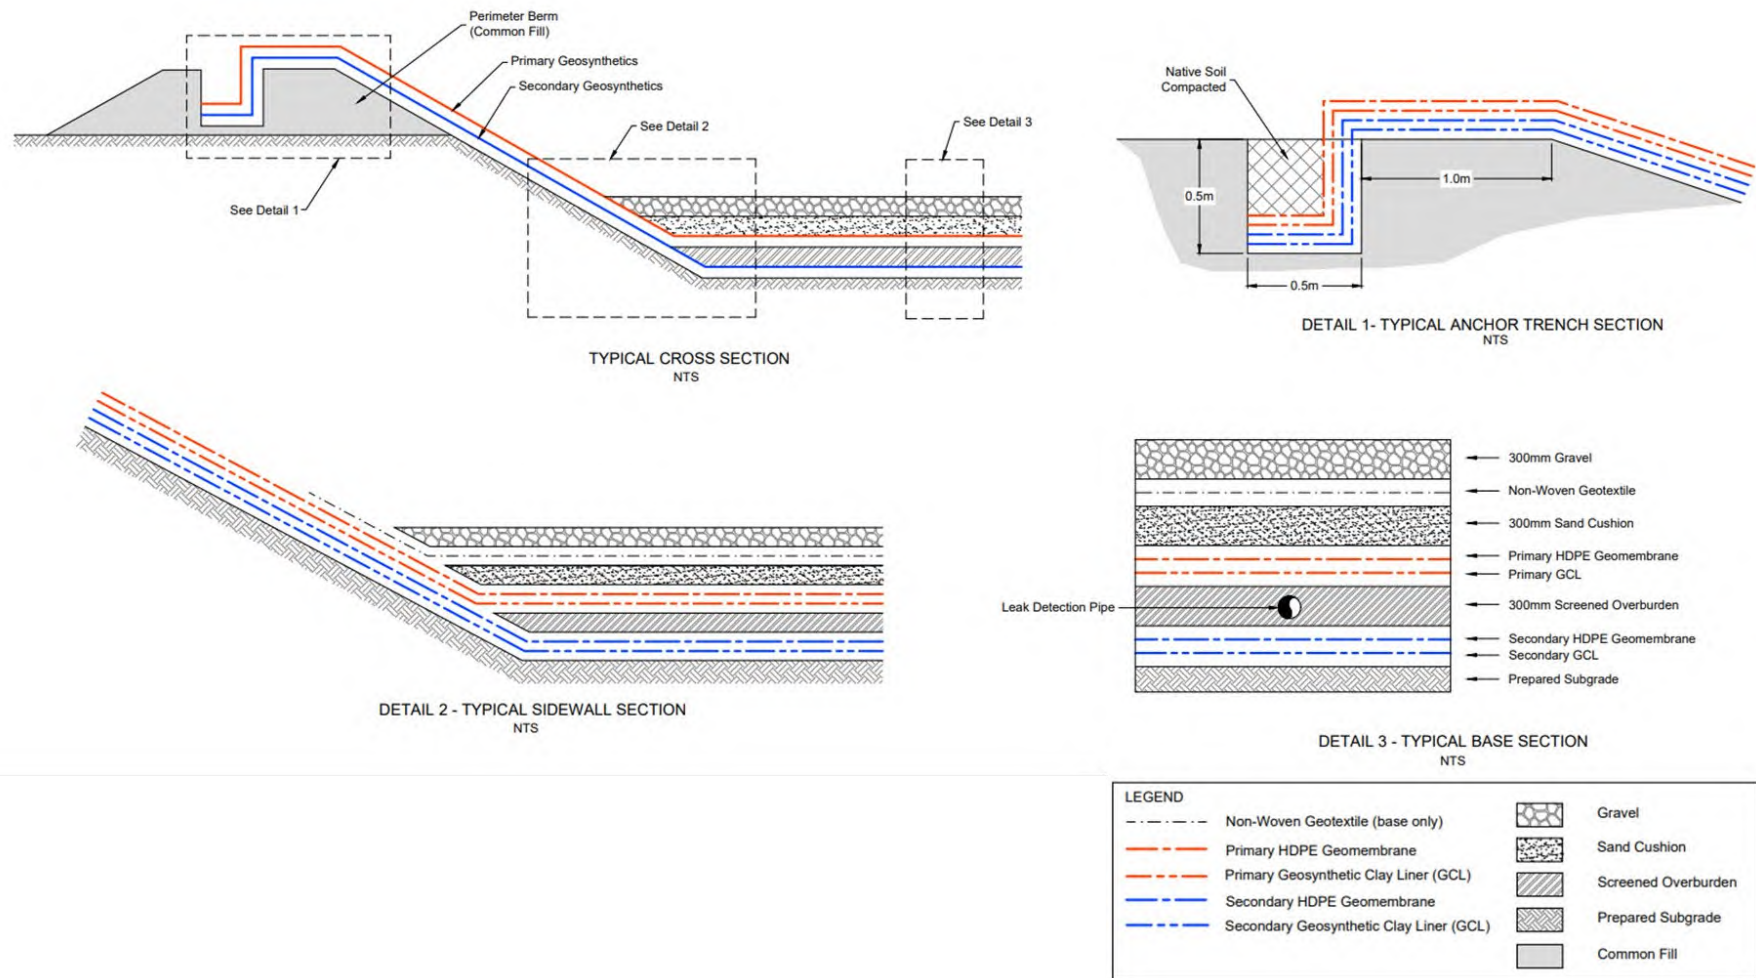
Pond Double Composite Liner System with Leak Detection Proposed for Uranium Bearing Solution Holding Area, Process Water Pond, Wellfield Runoff Pond, Landfill Leachate Collection Ponds, Process Precipitate Pond
